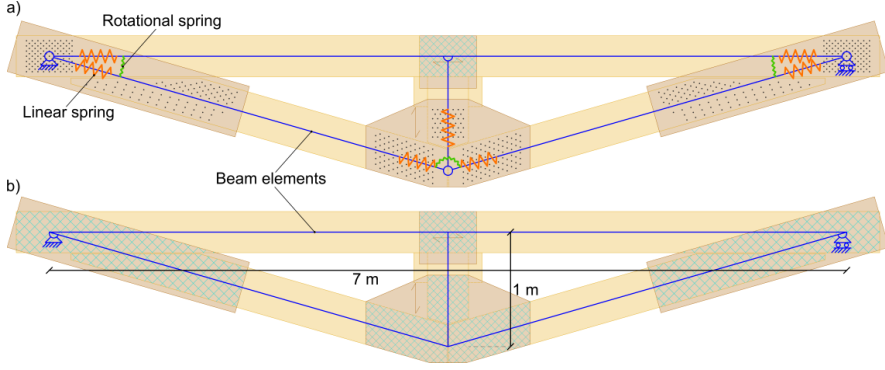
Illustration of numerical models: a) trusses with mechanical fasteners, b) glued trusses.
